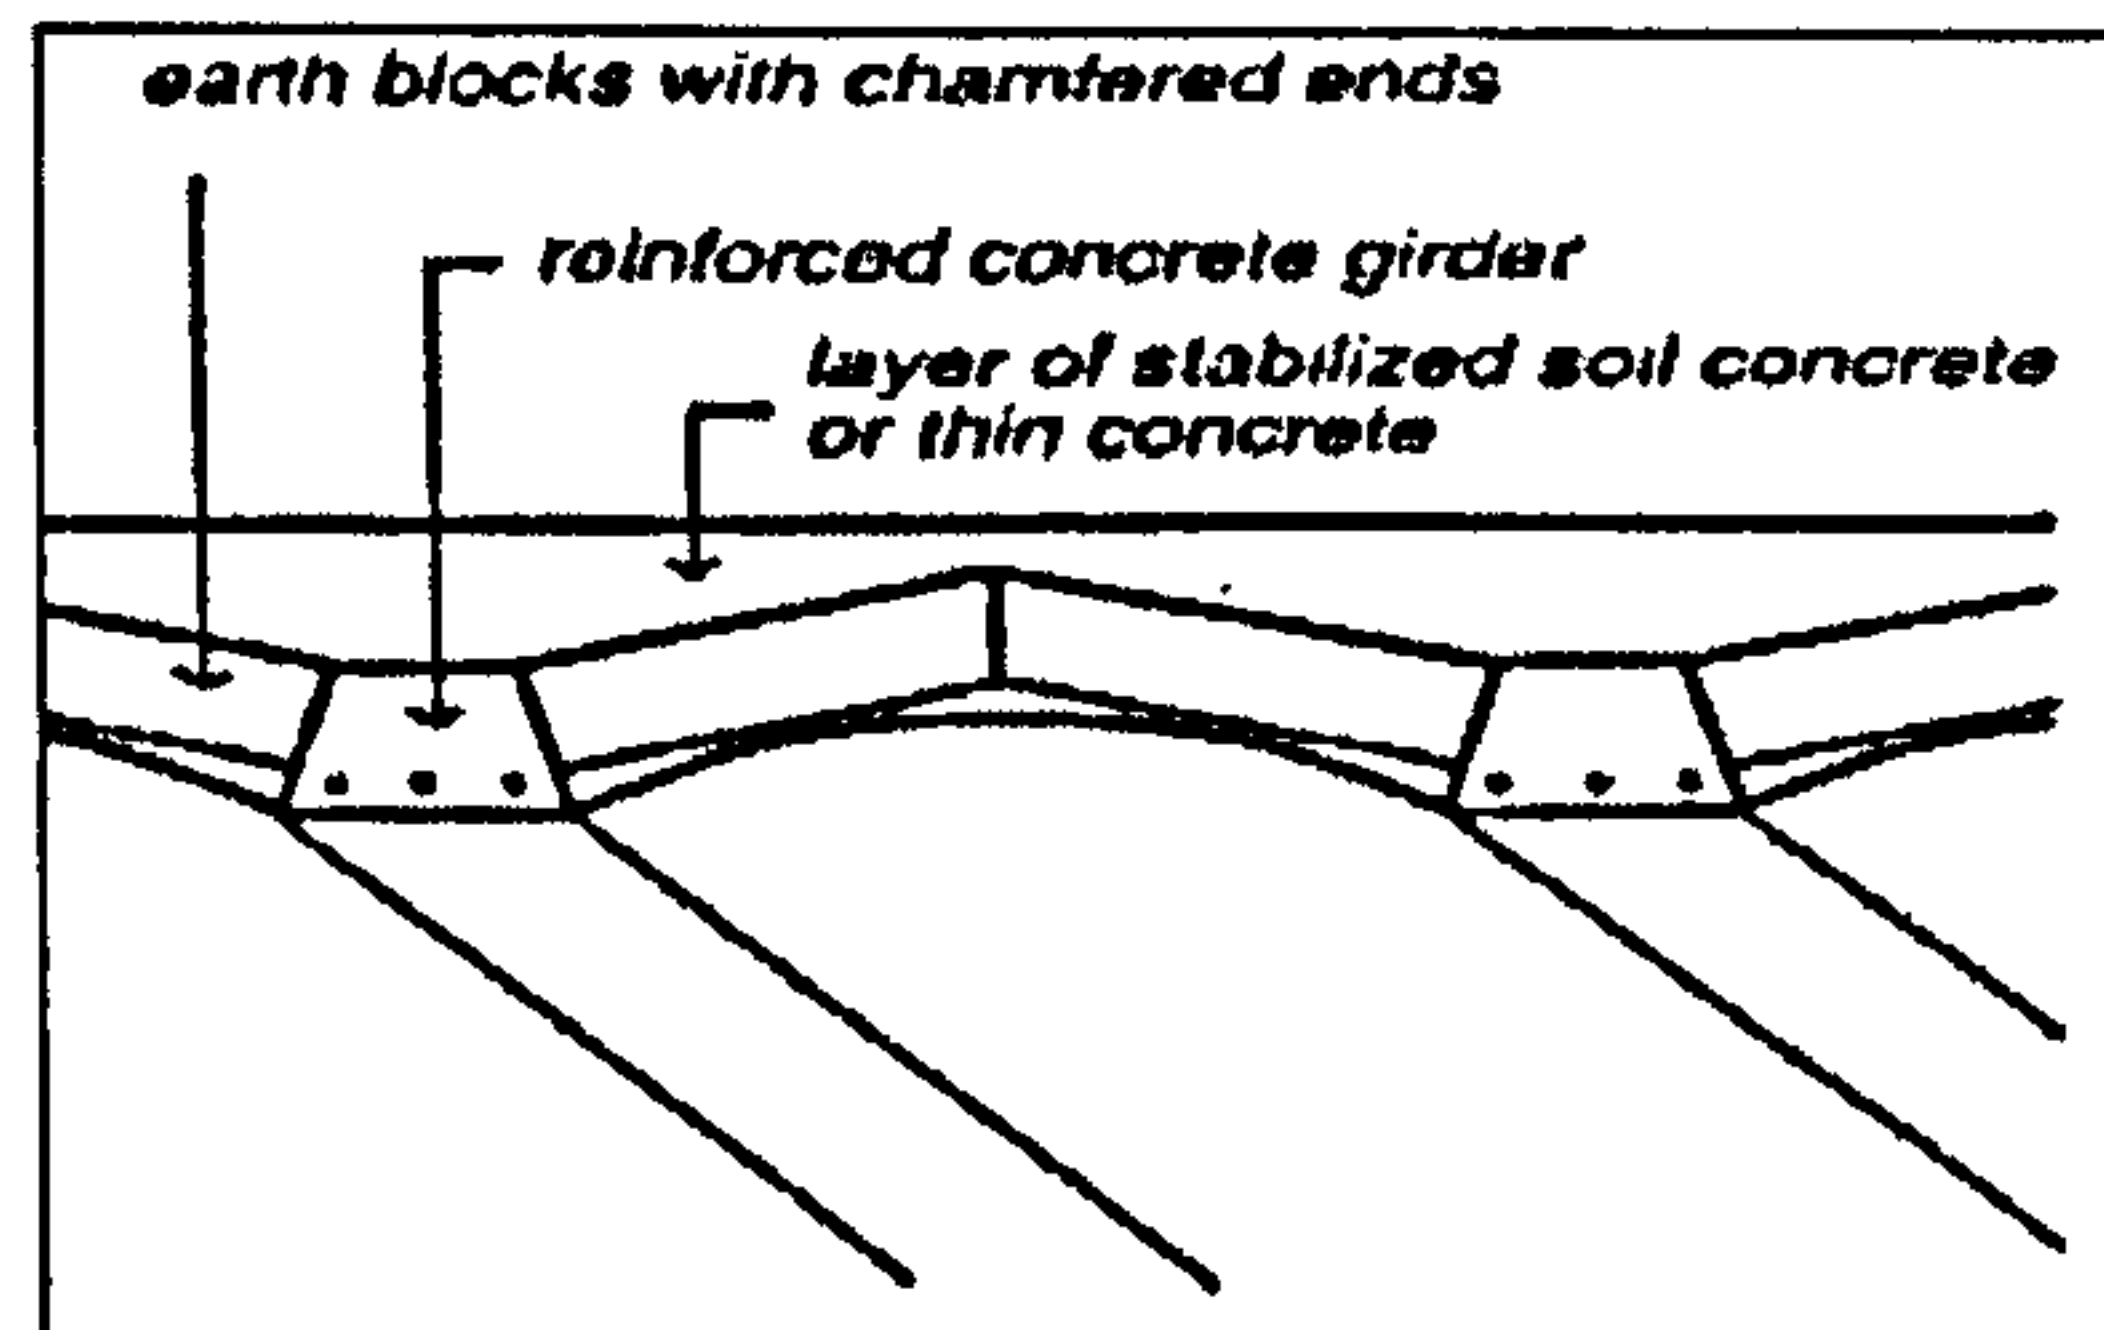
Floor utilising chamfered earth stabilised blocks. (14)
